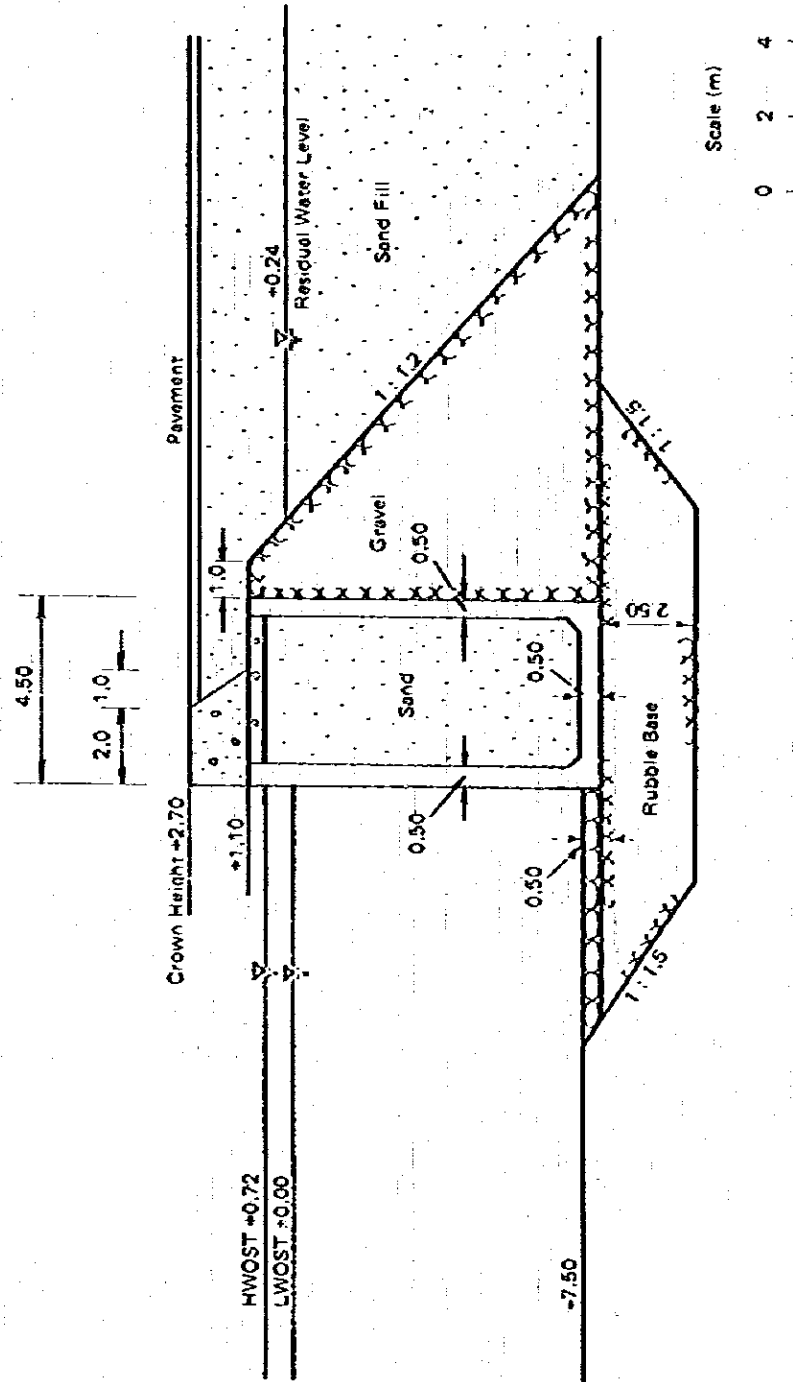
(b) Plane of Gravity-Type Caisson Bulkhead (-7.5m)
